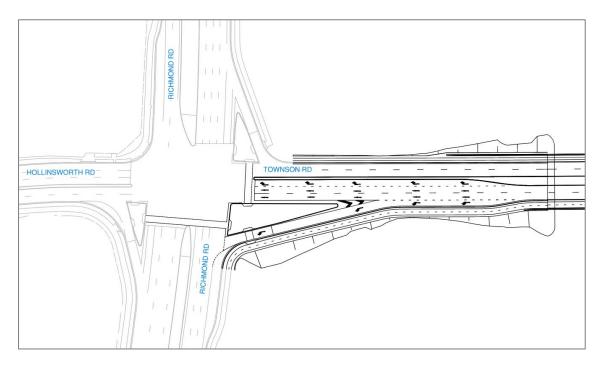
Plan view of the Richmond Road intersection – ultimate phase layout
